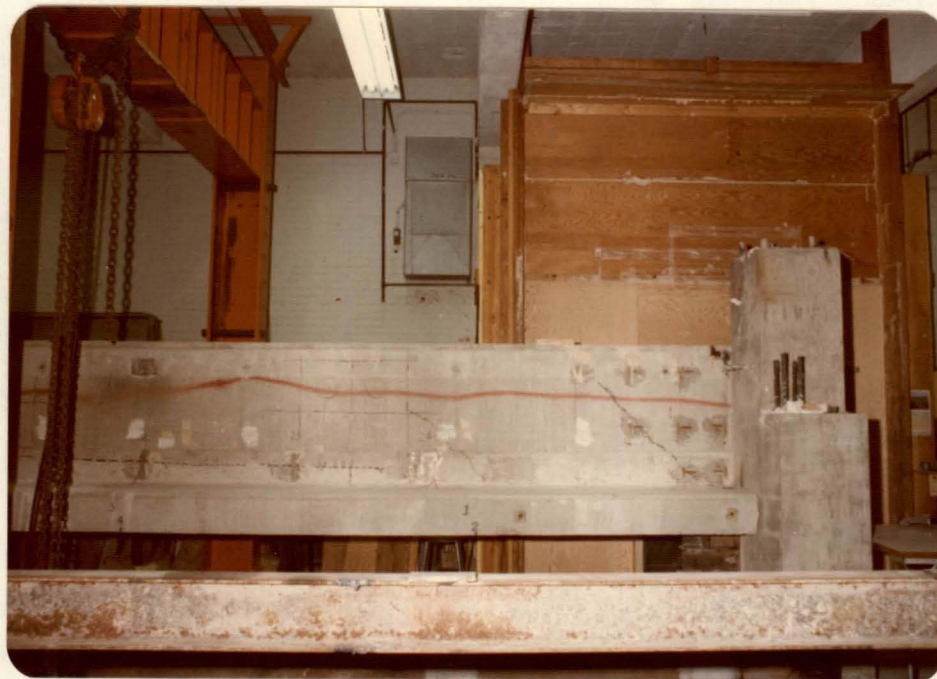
Close-up of Above, Exhibiting Horizontal Hairline Crack through Grout. South-End Reaction (Load Stage #6)
